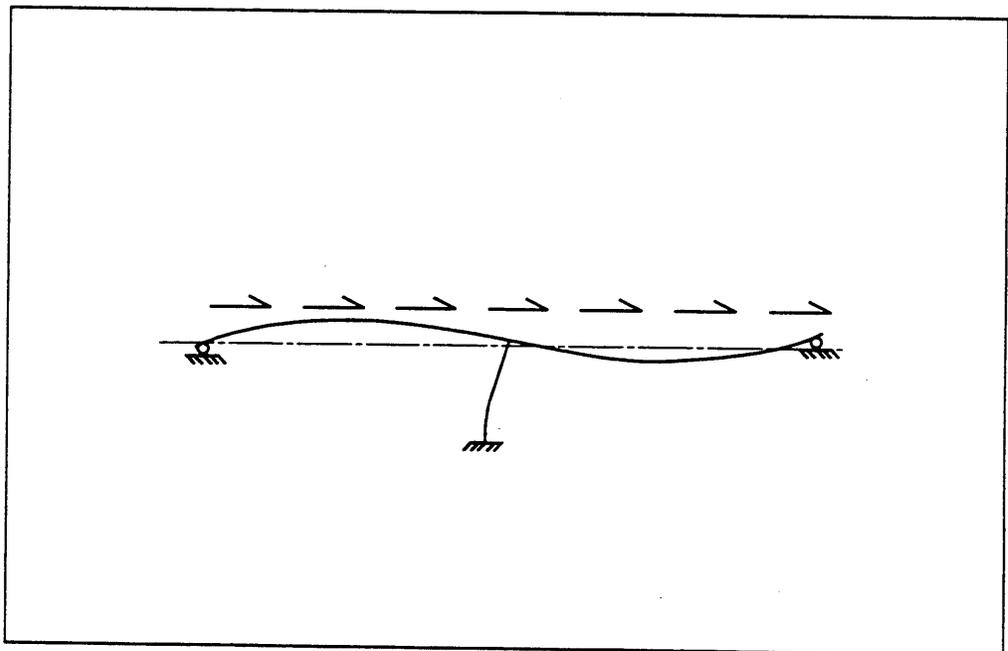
Bridge Layout with Seat-Type Abutment
